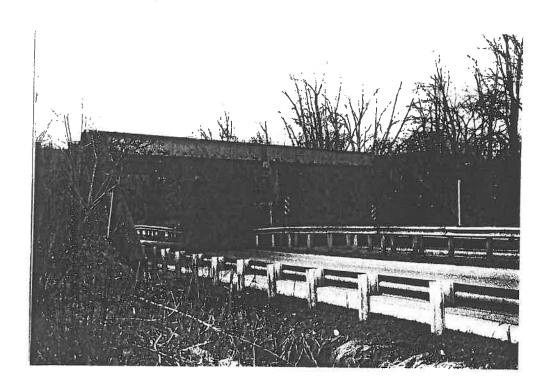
description: Through Rolled Girder Bridge over Rt. 1 Bypass, Portsmouth (55.83)
